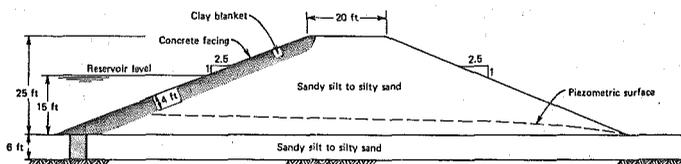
Cross Section through Sheffield Dam at Time of Failure
